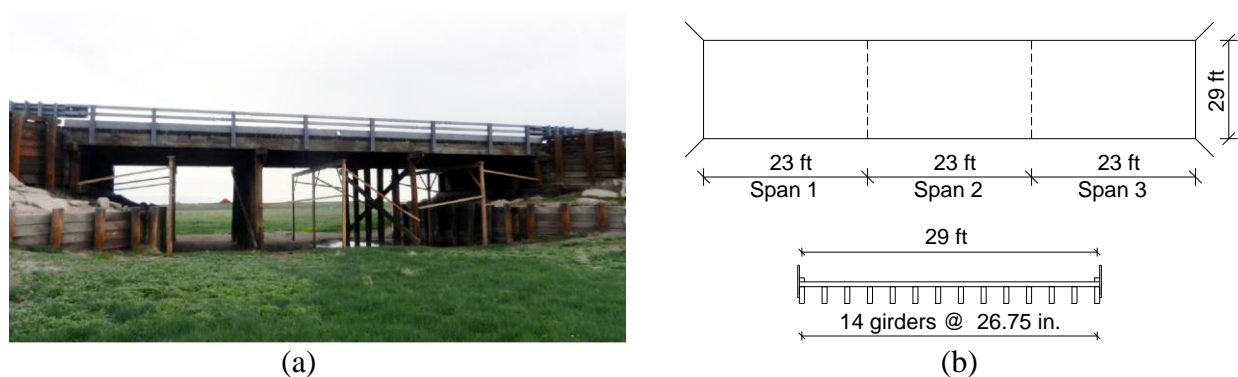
The F-22-V Bridge: (a) overview of site; (b) structural configuration
